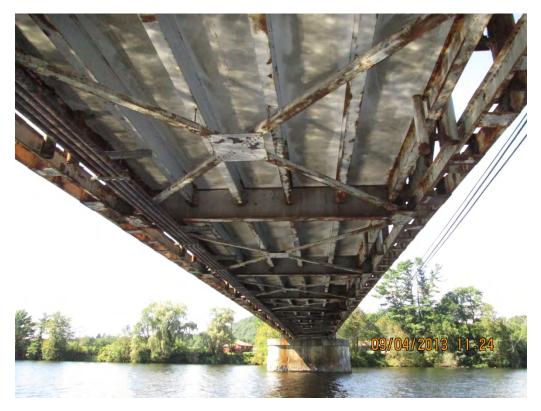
View from NH shoreline westerly toward VT shoreline of area of proposed temporary trestle location in VT.
